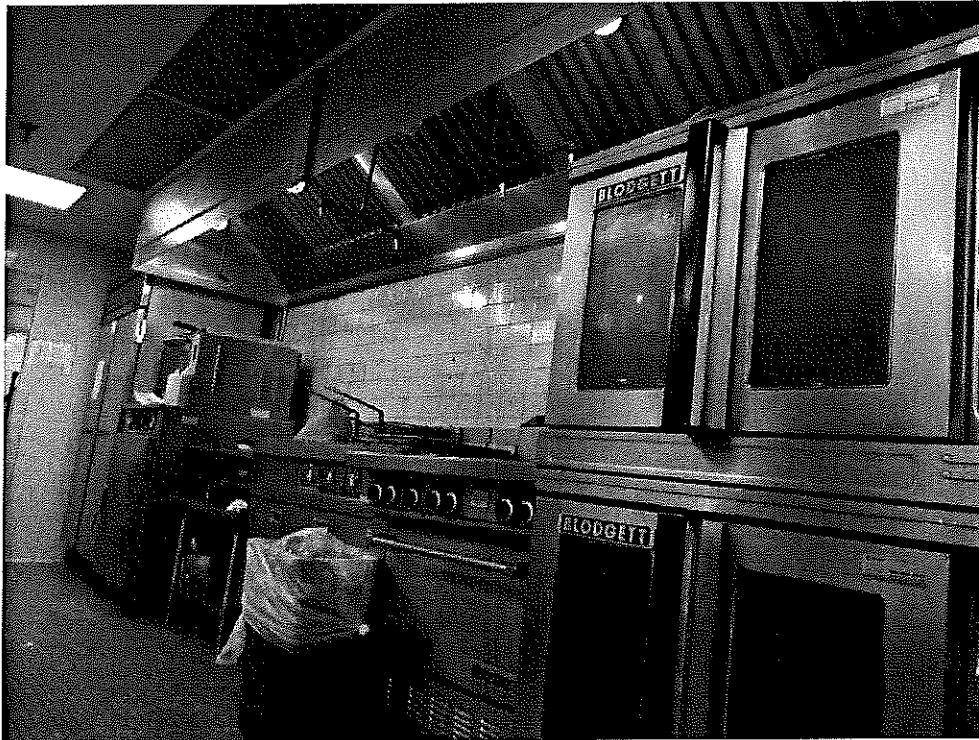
Electric Stovetop with Fire Suppression and Exhaust Hood
